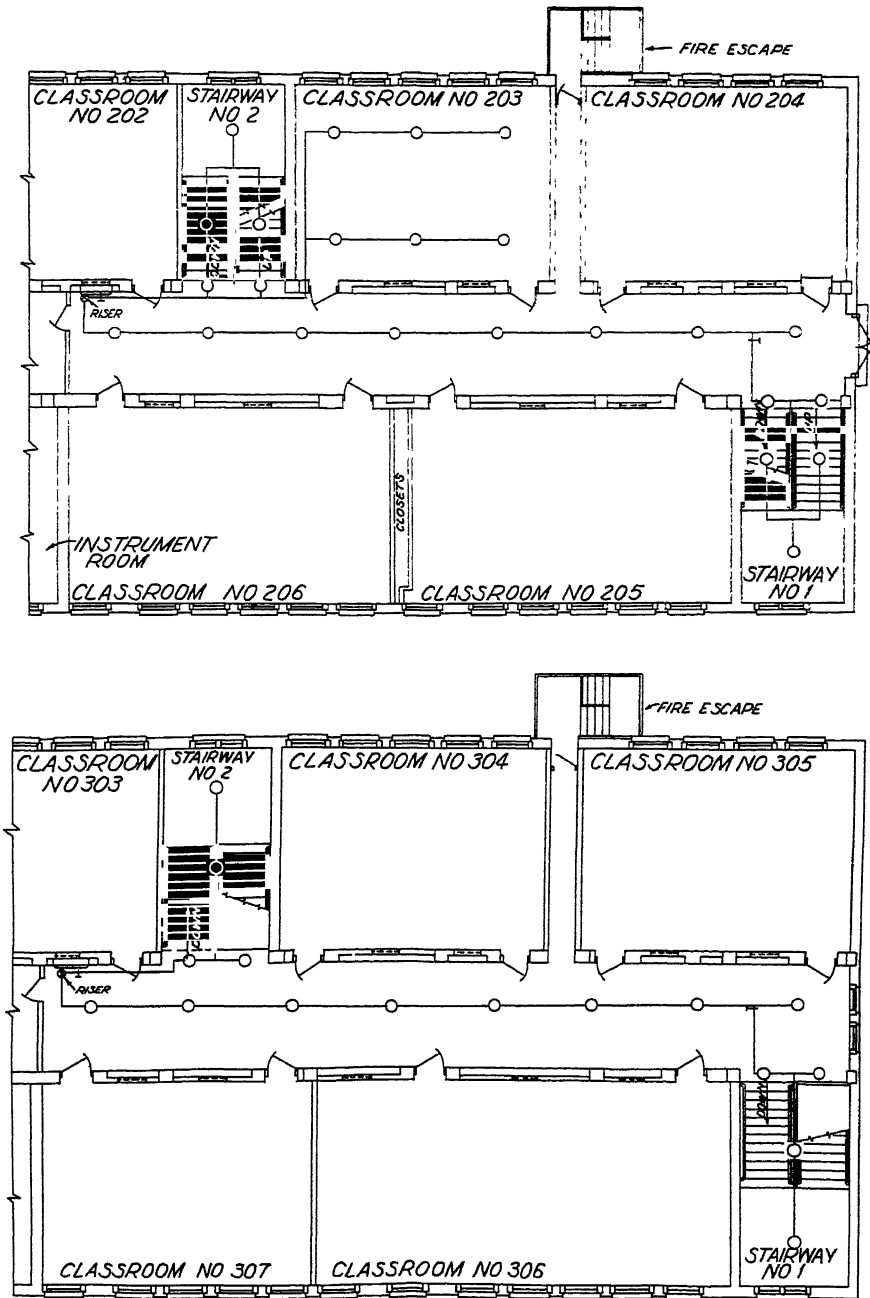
Cont. Floor plans of second (upper drawing) and third floors showing location of automatic sprinklers.
